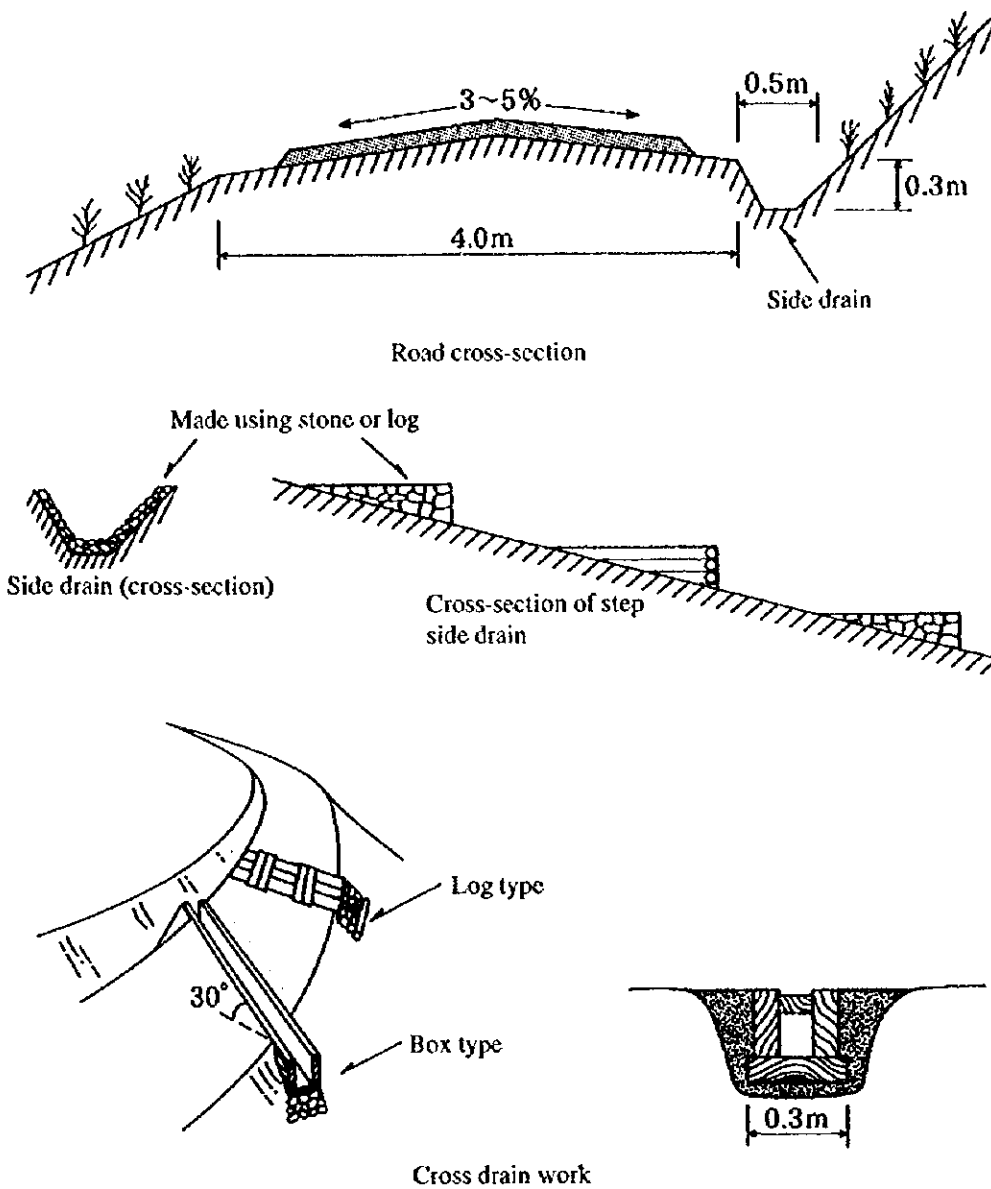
A Road Cross-section and Run-off Draining Facilities
